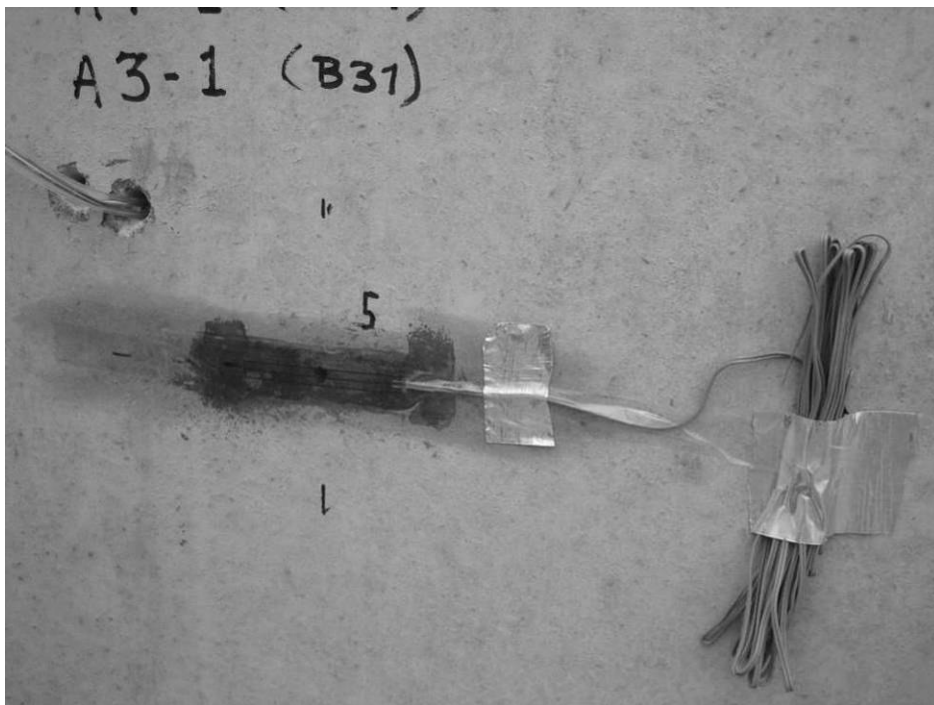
Install Concrete Strain Gages on Exterior Face of Wall Panels
